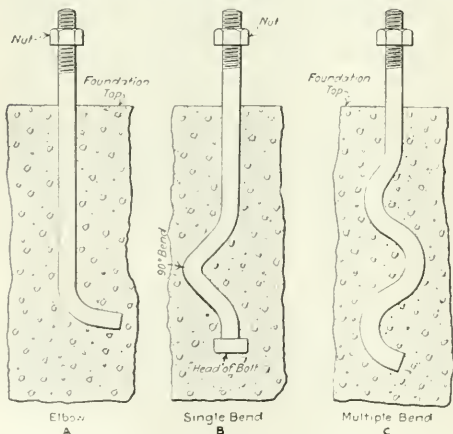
DEFORMED, DISTORTED OR BENT BOLTS
